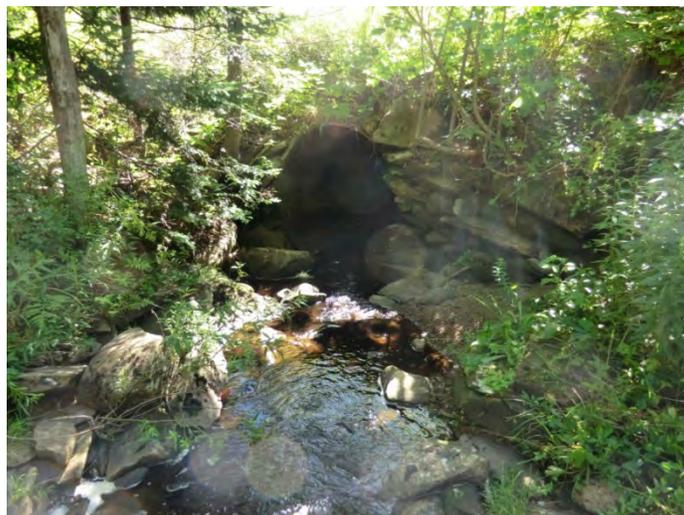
The culvert under Winhall Hollow Rd is not well aligned.
